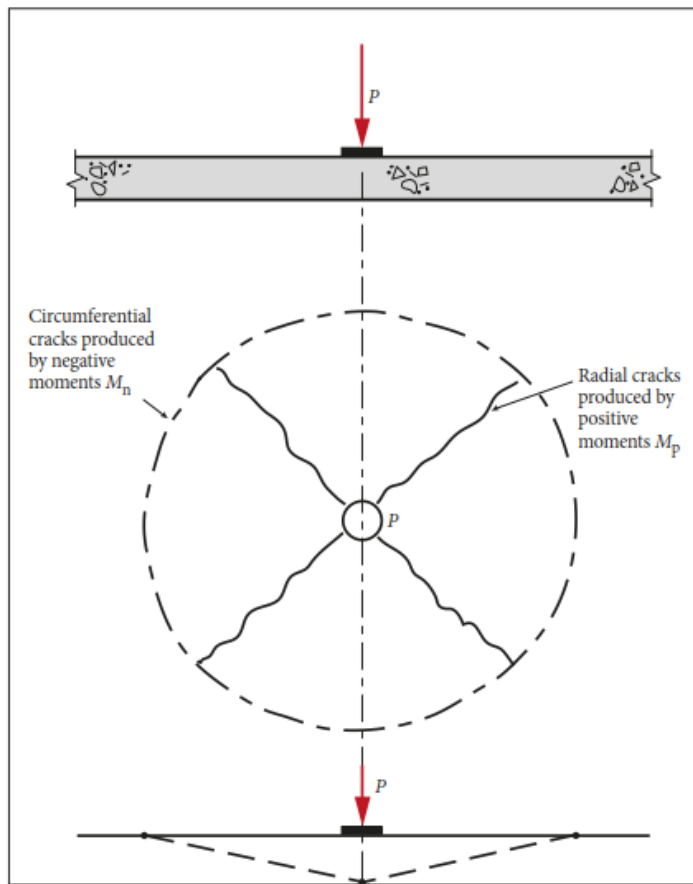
Radial and circumferential cracking pattern for a concrete floor on subgrade (The Concrete Society, 2016).
